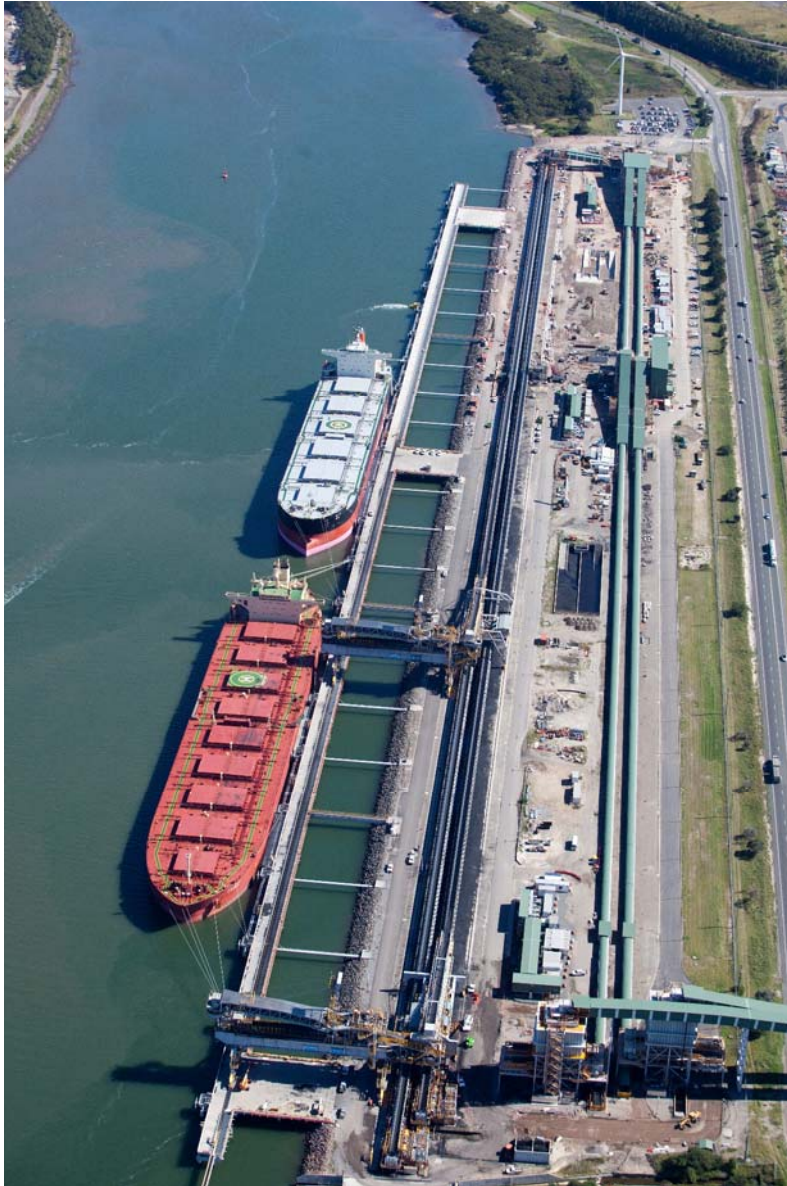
First coal delivered over Stacker Reclaimer 4.
